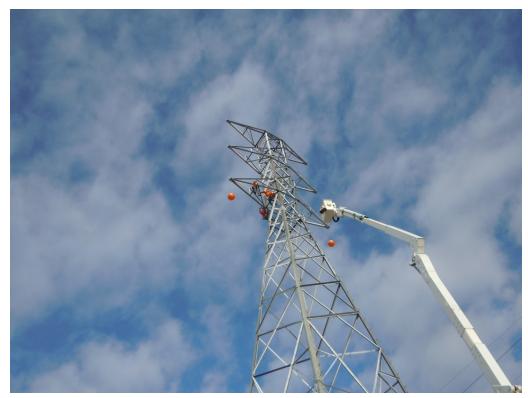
Crews assembling a tower and installing bird deterrents, Segment 8 Phase 2.
